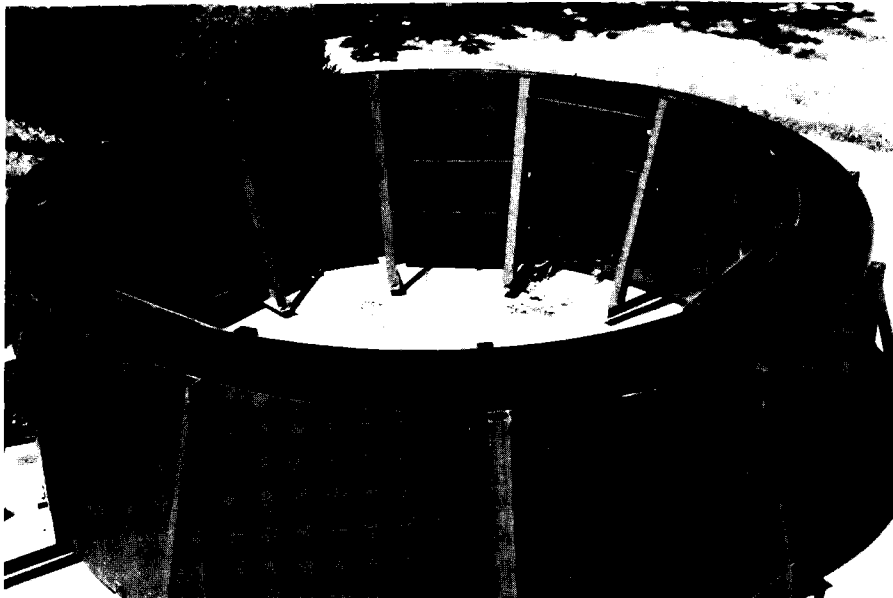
FORMS USED FOR CASTING THE SPECIMEN
